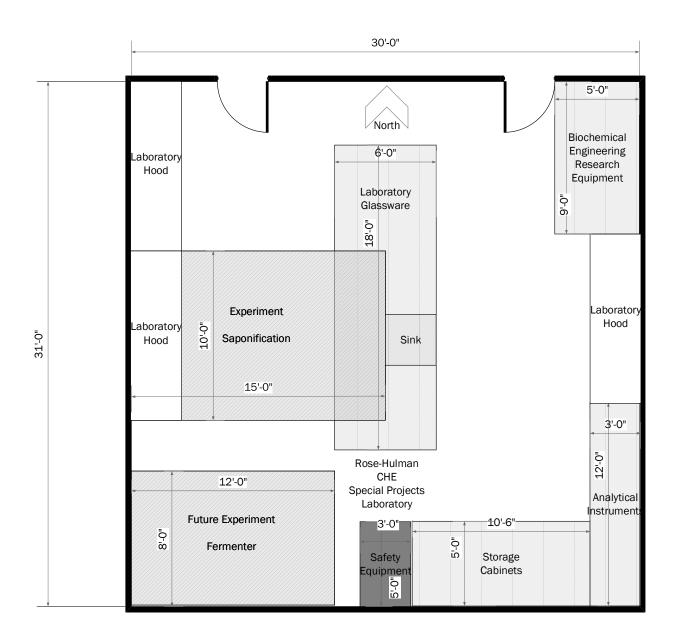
Special Projects Laboratory (O-226) Floor Plan
